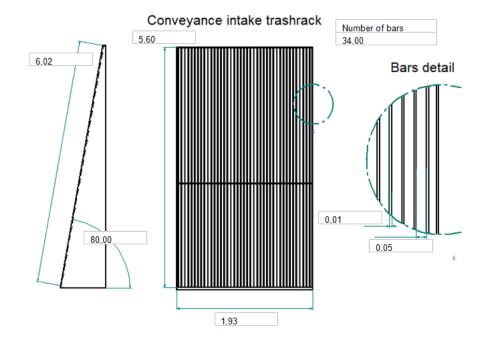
Conveyance intake dimensional drawing (trashrack)
